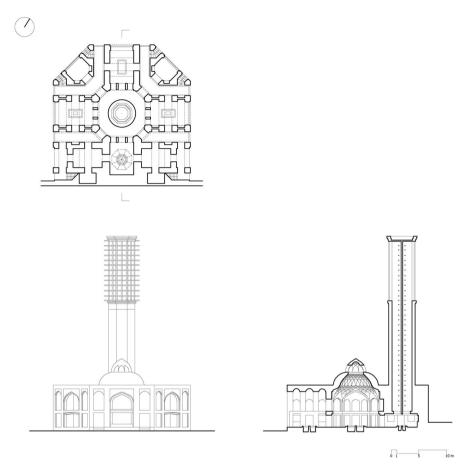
The Hashti pavilion at Bagh-e Dolat Abad: plan, SE elevation and section
